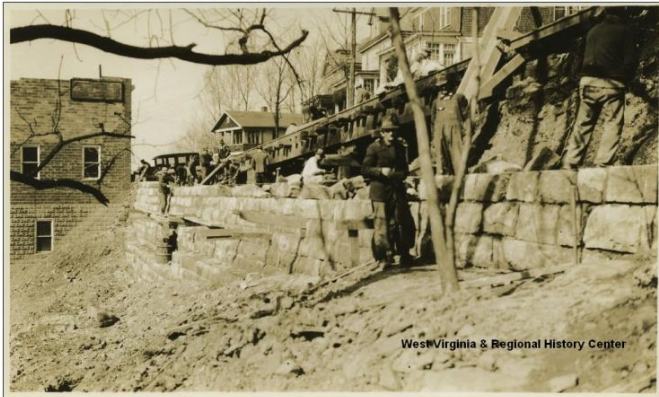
Richwood Avenue Wall at Monongalia Avenue
